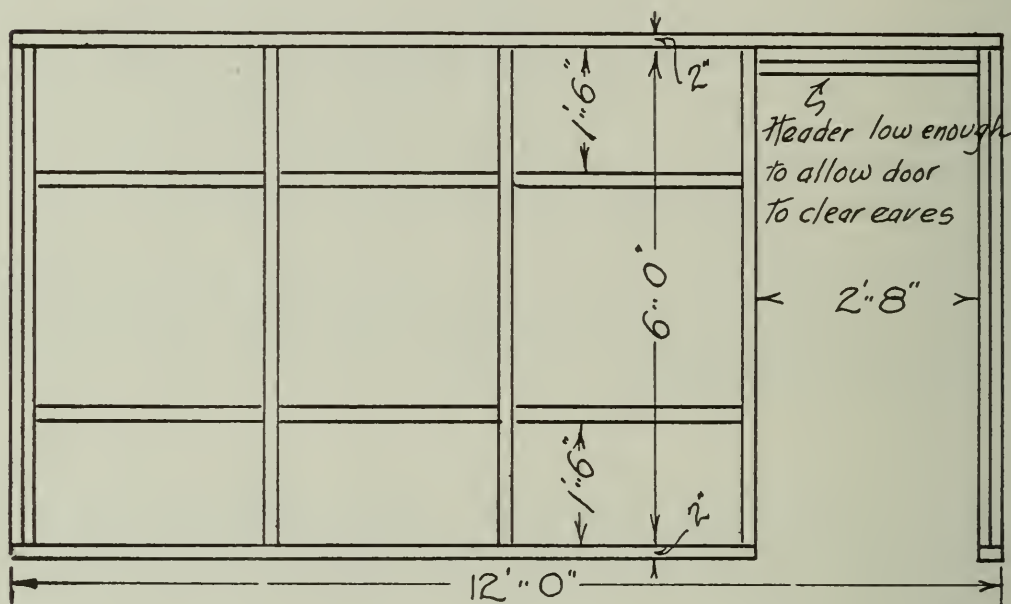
Poultry Breeding House 12' x 60' with glass substitute windows and cotton ceiling loft.
